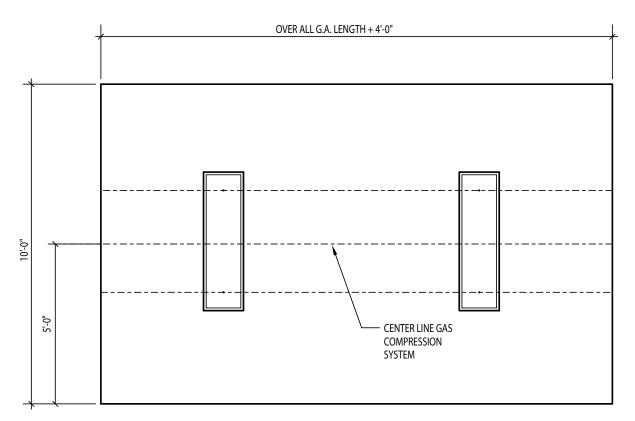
Foundation with Housekeeping Pads Dimensions - Top View
